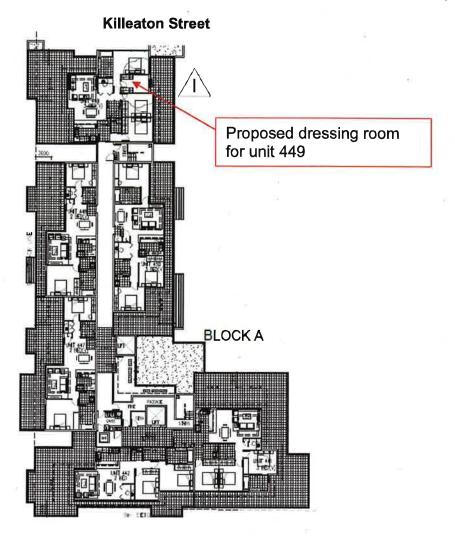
Unit 449 dressing room (Stage 2 – Level 4 Plan)
